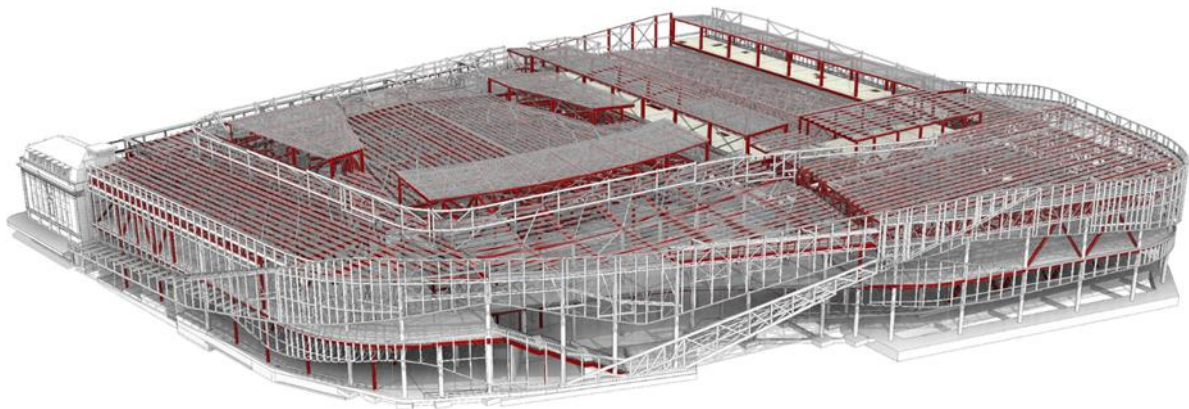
Structural BIM Model of Te Pae Christchurch Convention Centre
